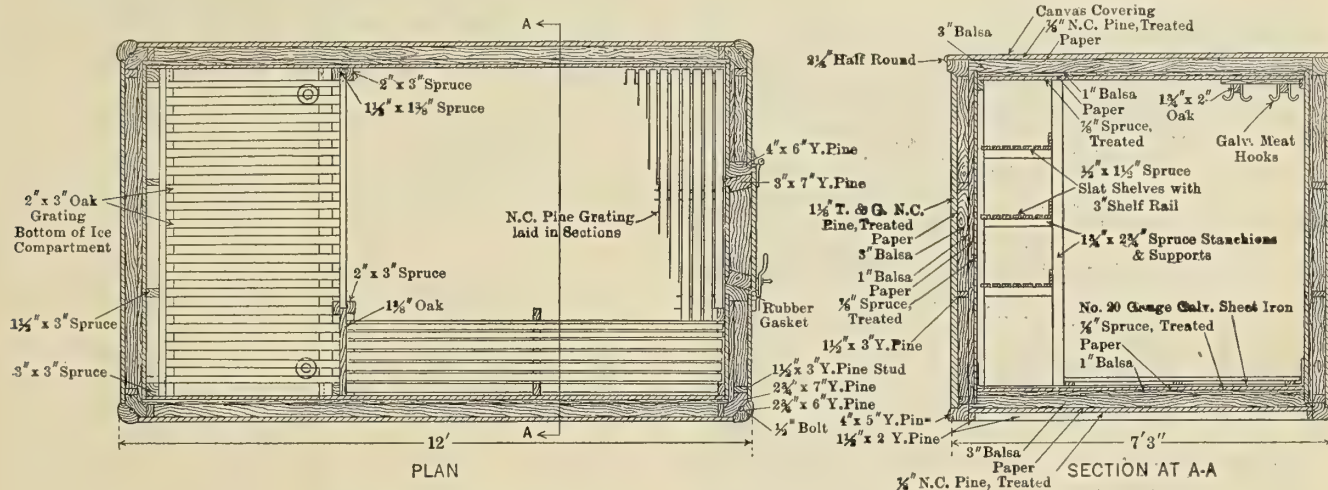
Plan and Section of Ice Chest, Showing Details of Construction
